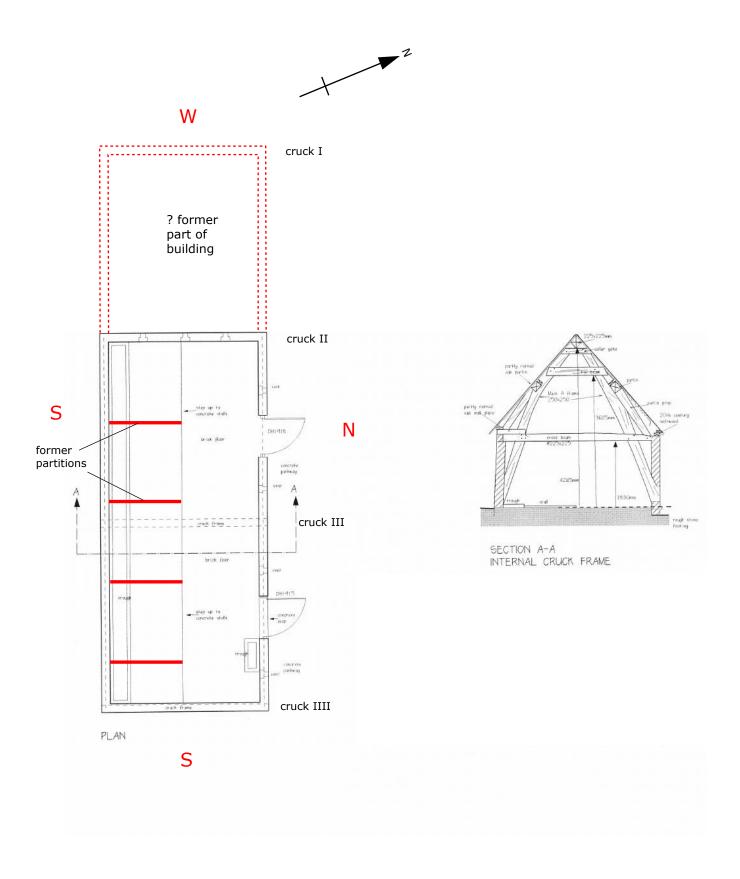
Plan and section across centrally-placed cruck frame within animal shed at Holywell Farm, Loughborough. Scale 1:100. *Original drawings supplied by Anthony Short & Partners.
